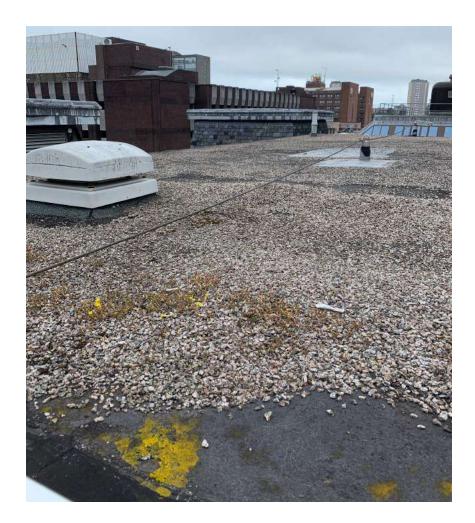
shows the area and condition of the existing roof where these units are proposed to be installed.
